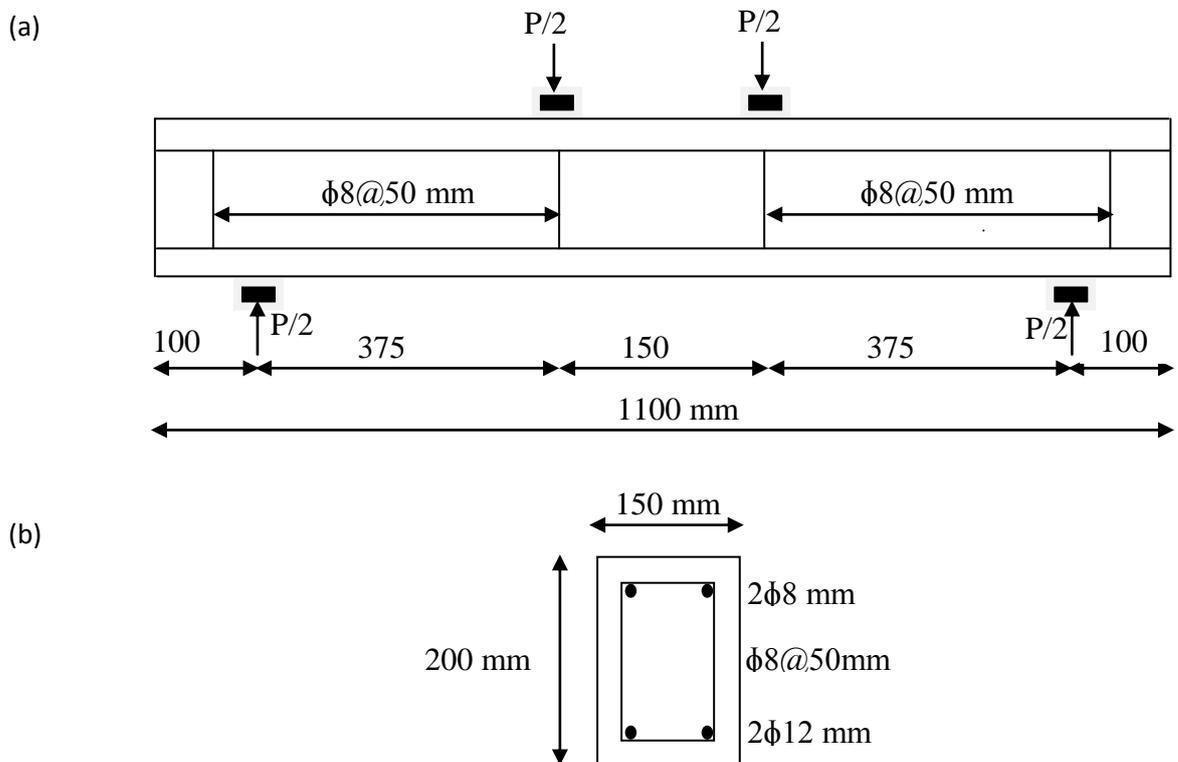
Cracked Beam (a) layout and (b) Cross section
